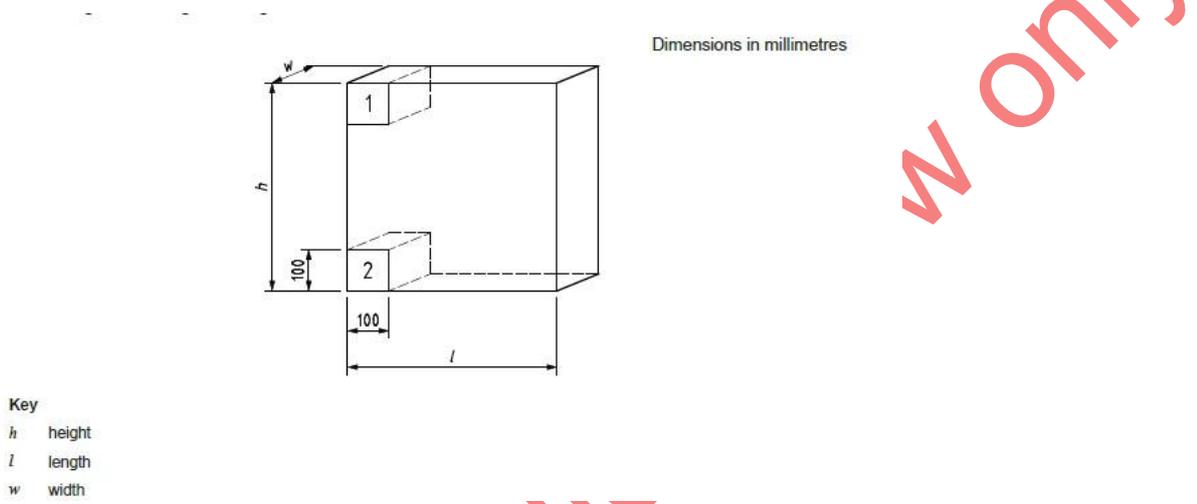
Cutting scheme for freeze-thaw resistance testing
